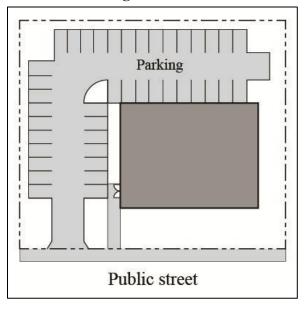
Parking to the Side or Rear of Buildings.
